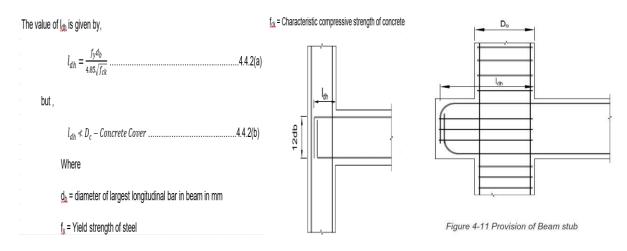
Anchorage of beam longitudinal bars (NBC 105:2020, Annex A)
